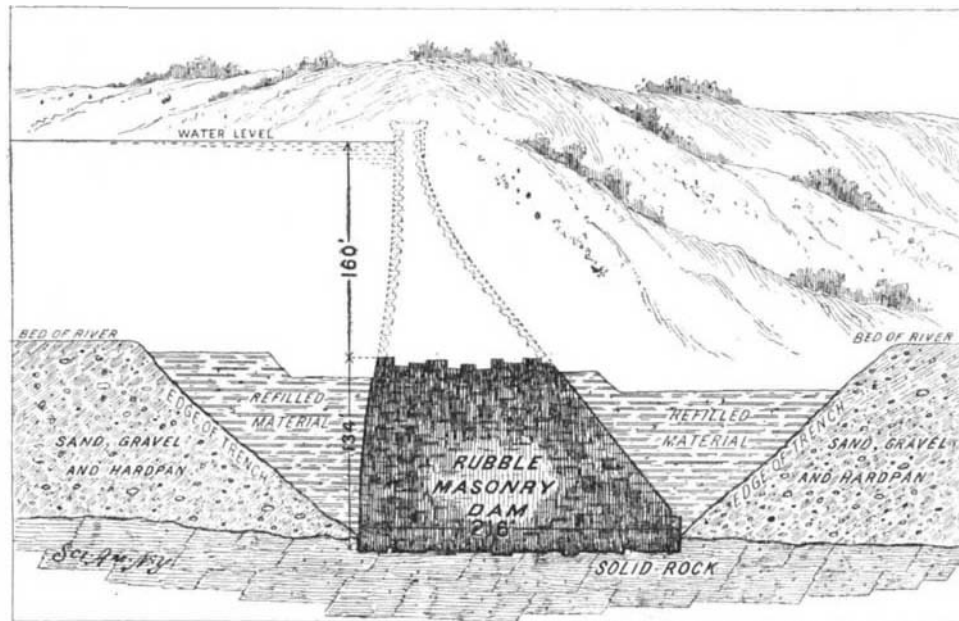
Section Through Croton Dam, Showing the Excavation, Completed Masonry, and Refilled Material.
